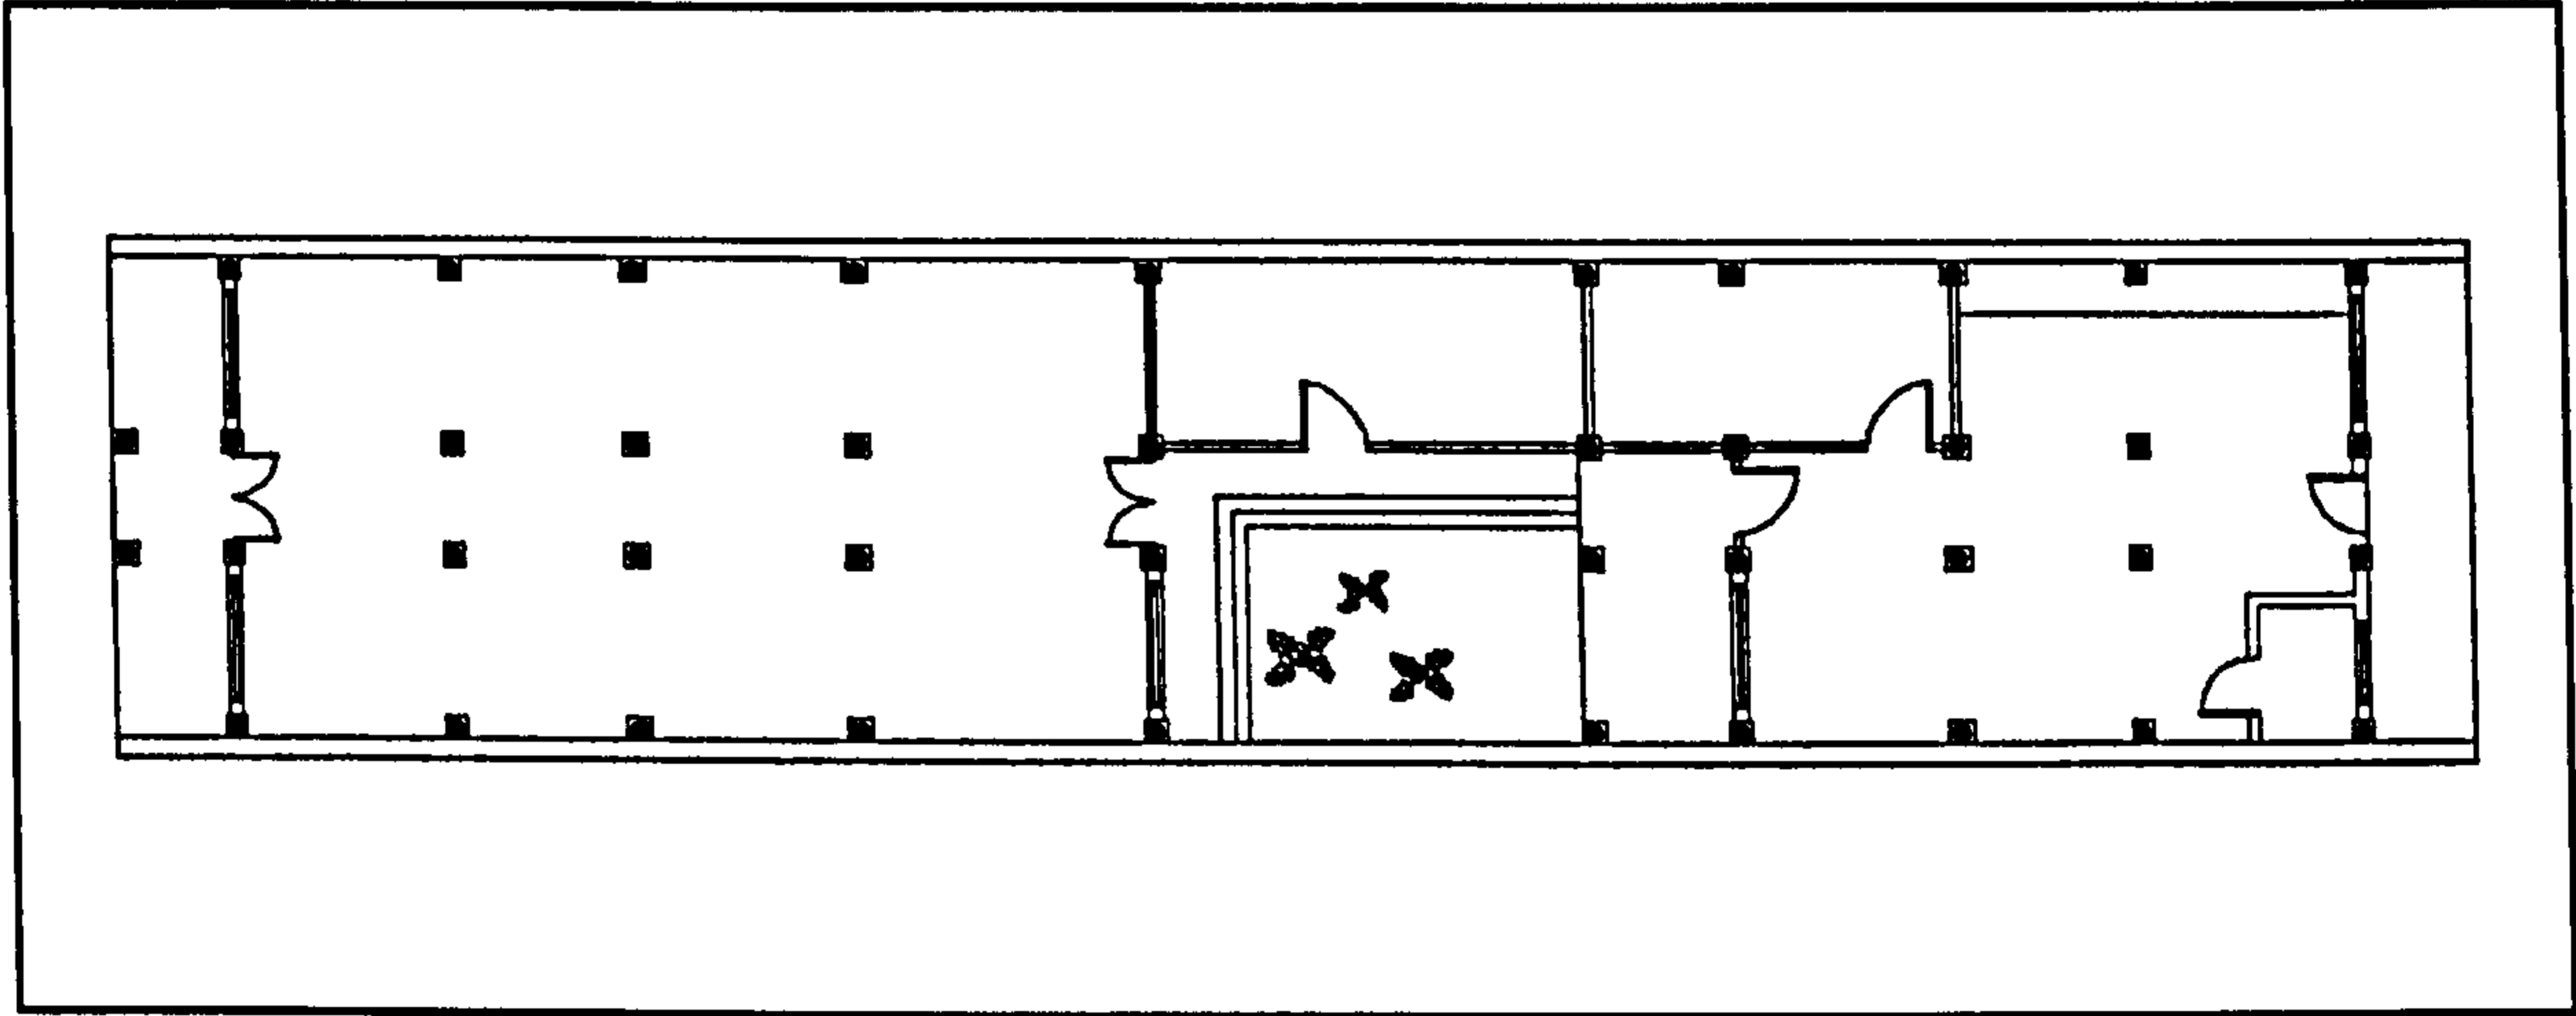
Typical Floor Plan of Hoi An Shophouses
